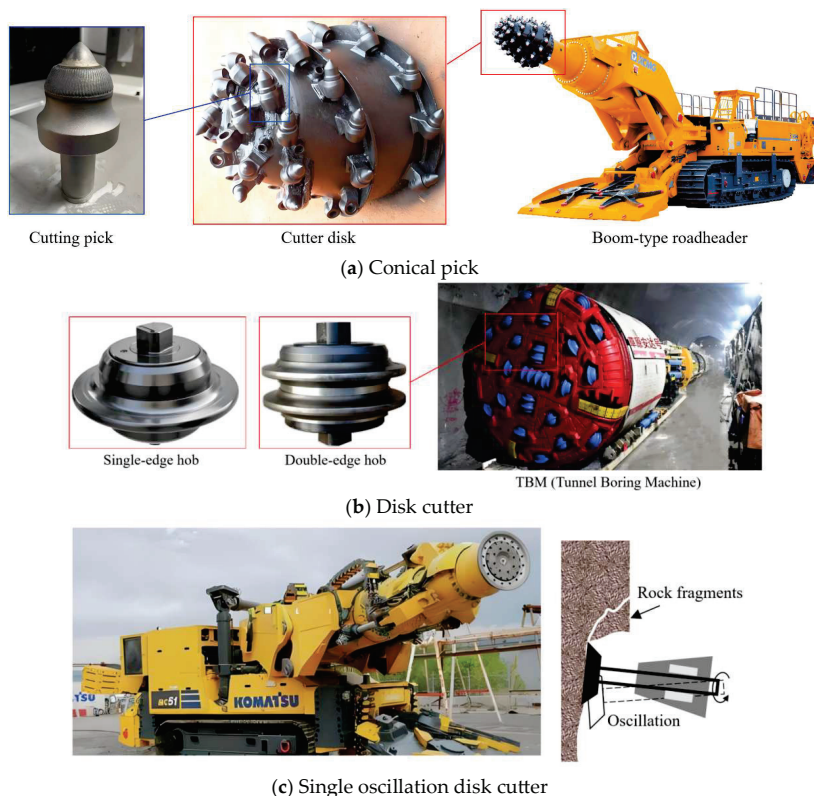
Types of tunnel excavation equipment and cutting tools in mining engineering.
